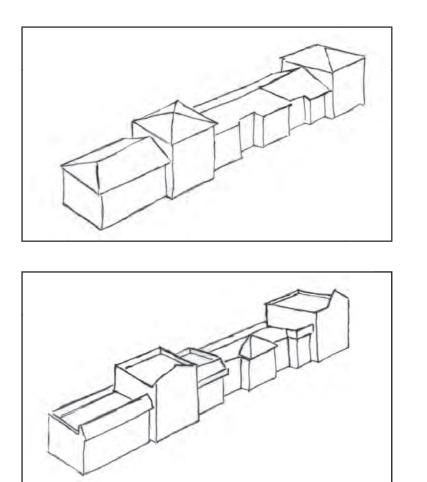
Continuity of Building Form and Mass with Enclosed Roof Type
